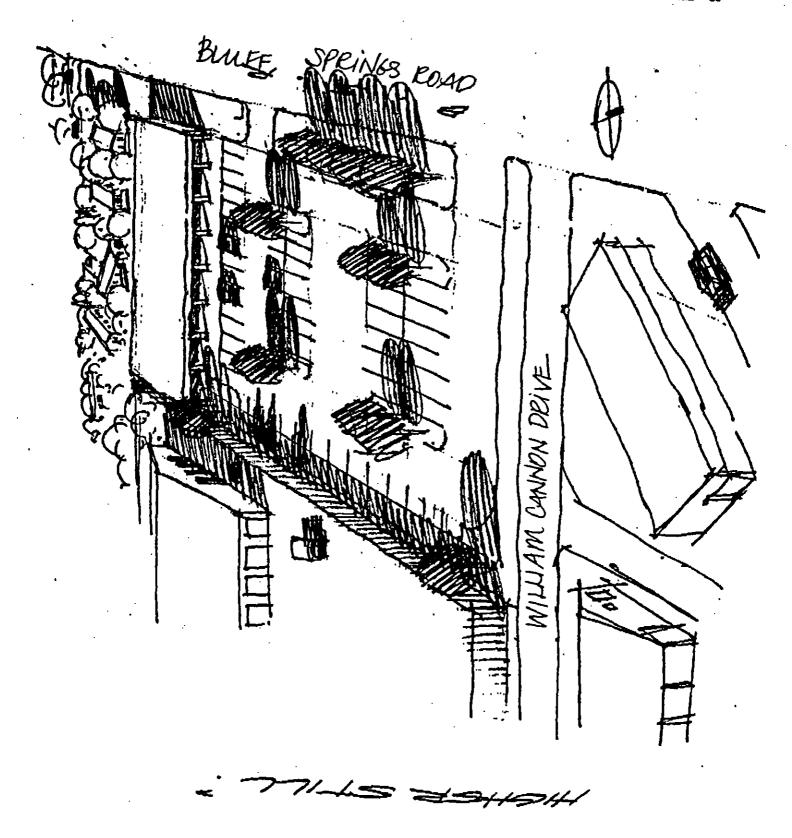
EXHIBIT C APRICANT'S CONCEPTUAL PLAN
